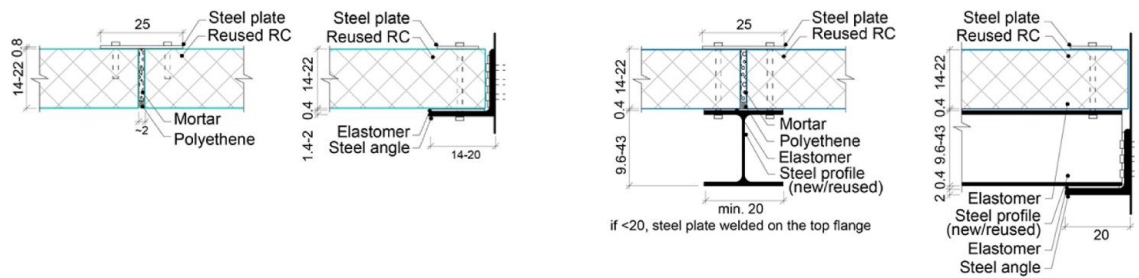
Longitudinal and transversal sections of connection details. For primary (left) and secondary structure (right). (Küpfer et al., 2024)
